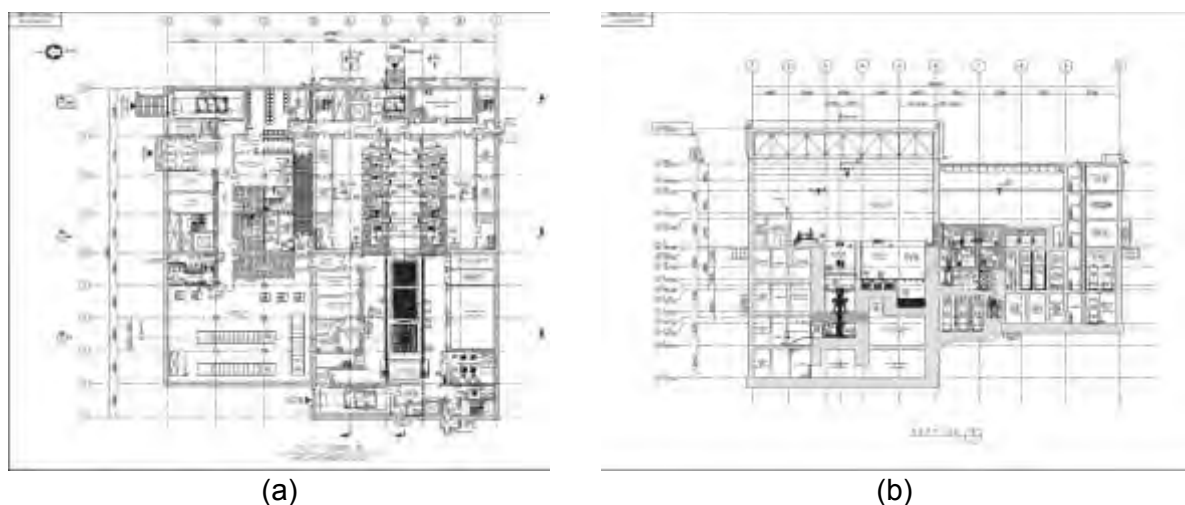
General arrangement for KJRR, (a) plan view at the first floor and (b) section view in the middle
